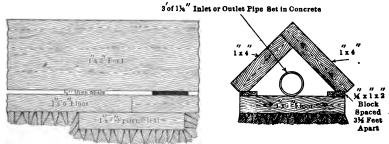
Wooden conduits for combined drainage and irrigation.
